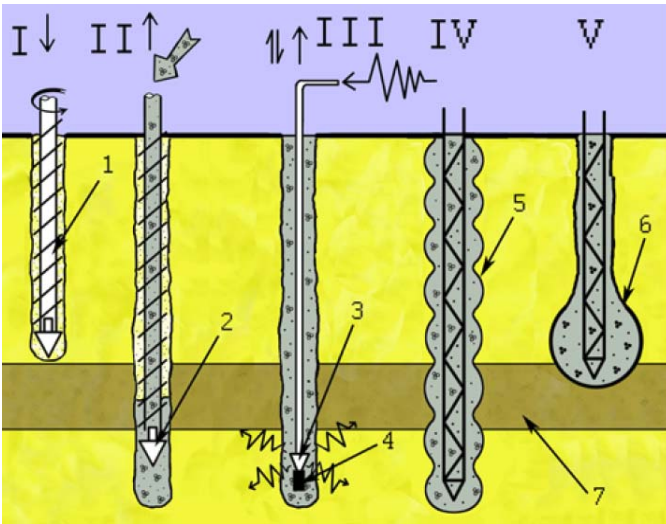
Construction of pile applying the Geotechnical Electrical Discharge Technology. (I) Drilling; (II) Filling with concrete mixture; (III) Electric discharge; (IV and V) Lowering of reinforcement into hardening concrete mixture.
